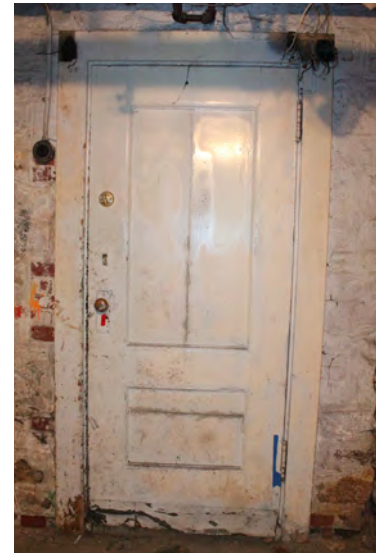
Two-panel wood door to basement. (HA, 2015)
